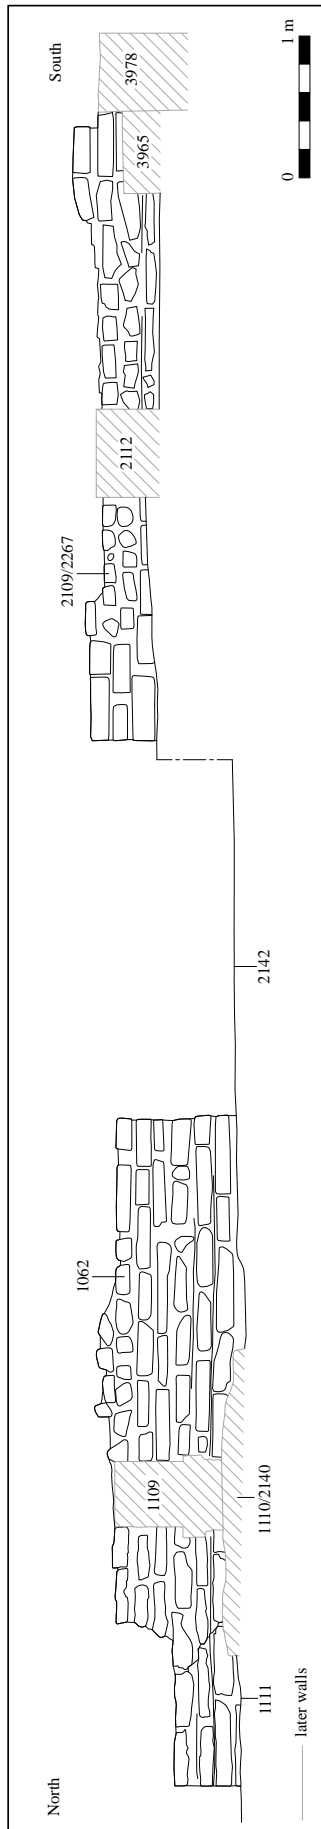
West-facing elevation of walls 1062 and 2109/2267
